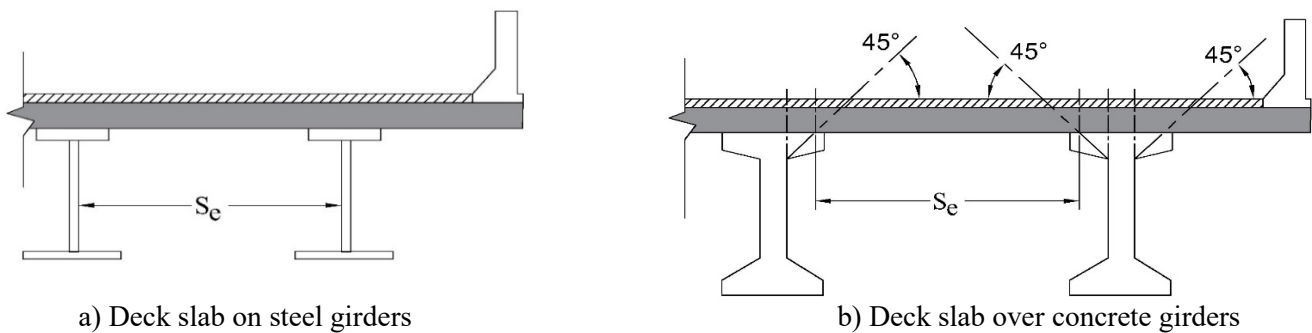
Cross-sections of bridge girders showing the deck slab and overhang (adapted from [1])
